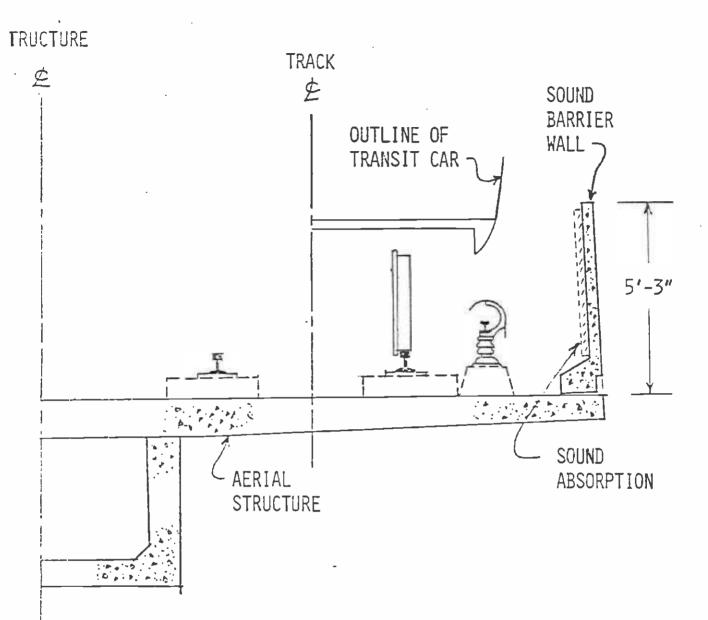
CROSS-SECTION OF MARTA AERIAL STRUCTURE SHOWING THE CONFIGURATION FOR SOUND BARRIER WALLS
